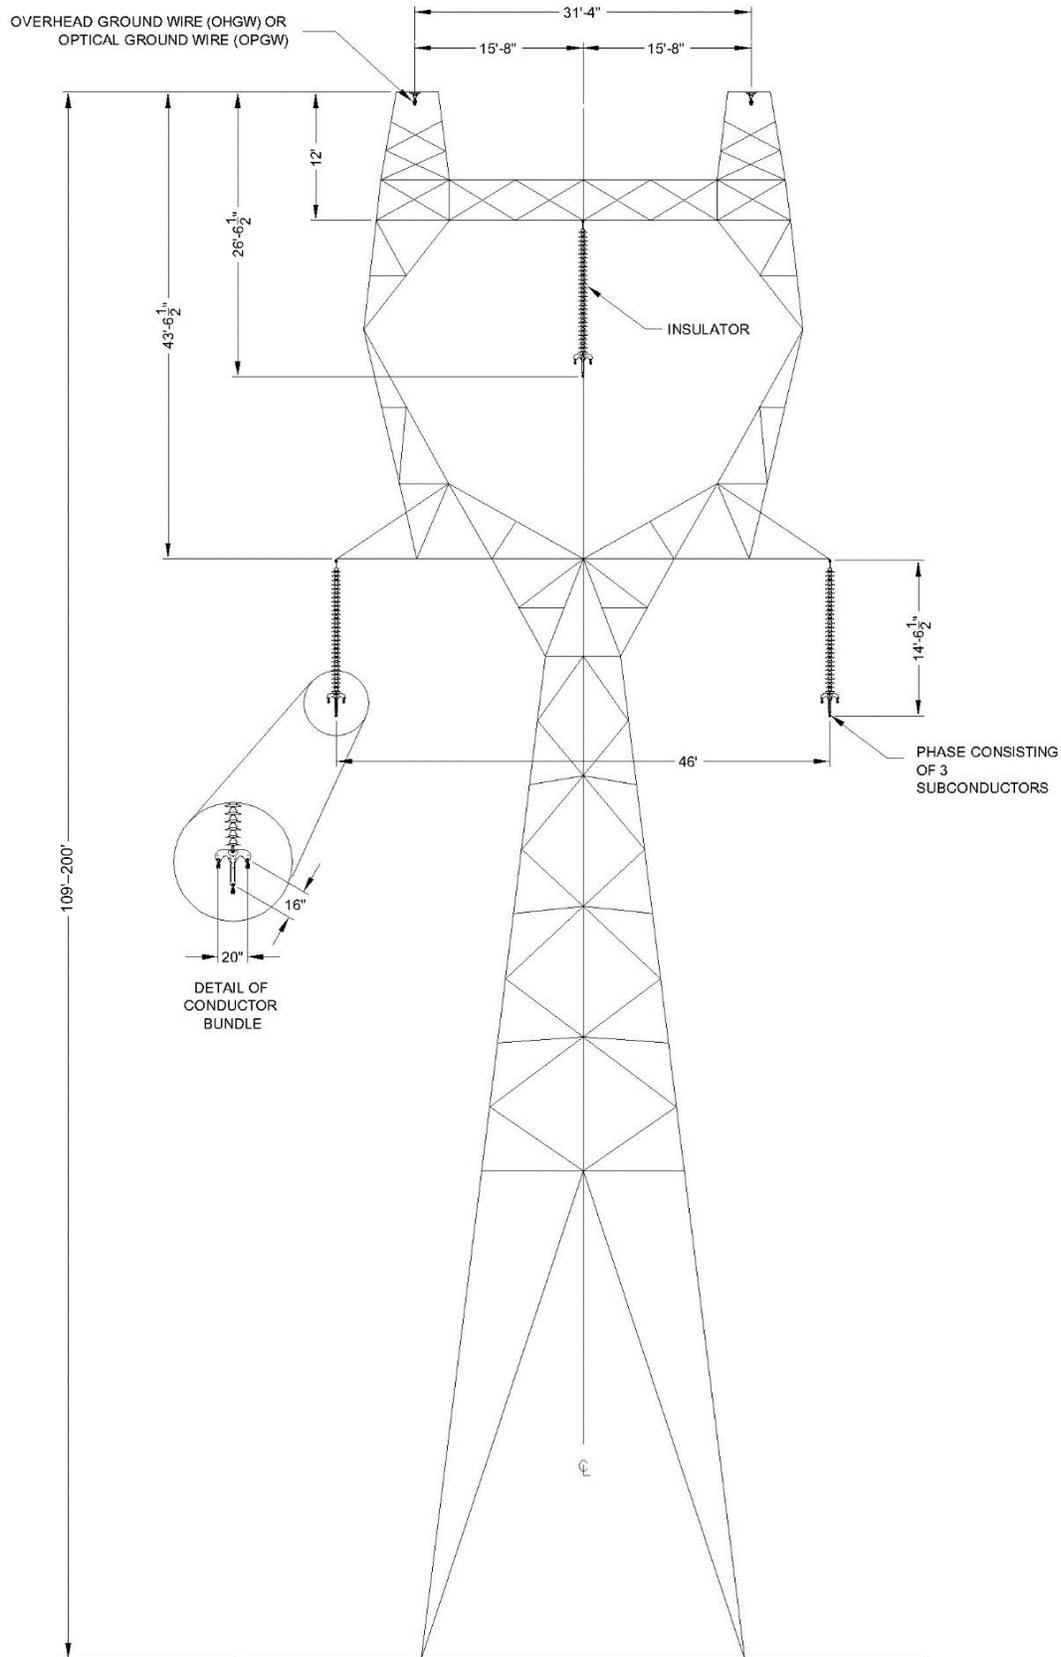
Proposed 500-kV Single-Circuit Lattice Steel Structure
